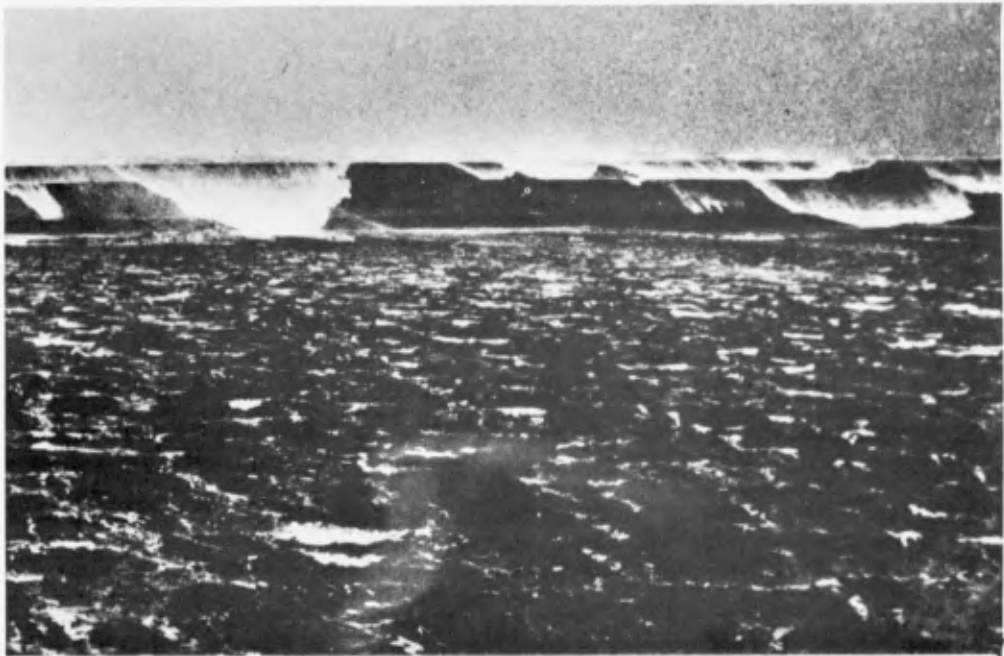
Asphalt wall overtopped. (Copyright Van der Pijl, Harlingen, Holland).
